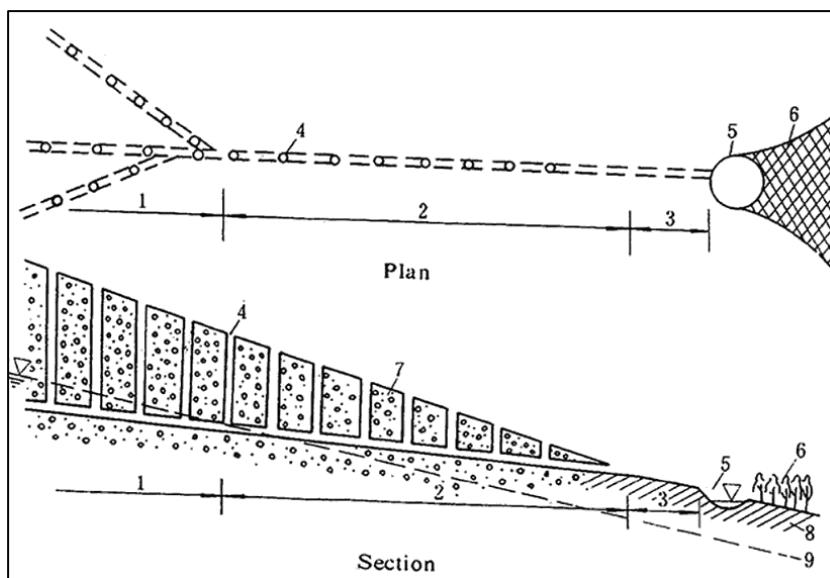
Schematic side and top views of a karez showing (1) a water harvesting underground tunnel, (2) a water-conducting underground channel, (3) an open channel, (4) vertical wells, (5) a small storage pond, (6) the irrigated area, (7) sand and gravel, (8) layers of soil, and (9) the groundwater surface.
